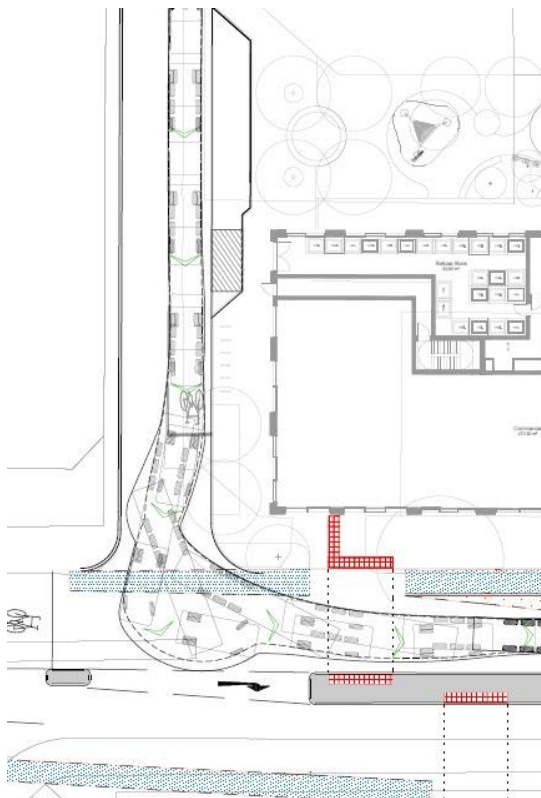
(right): proposed indicative configuration of the southwest leg of the roundabout, showing how the tip of the footway peninsula (red hatch) would need shortening to accommodate the path of a 16.5 metre articulated lorry.
